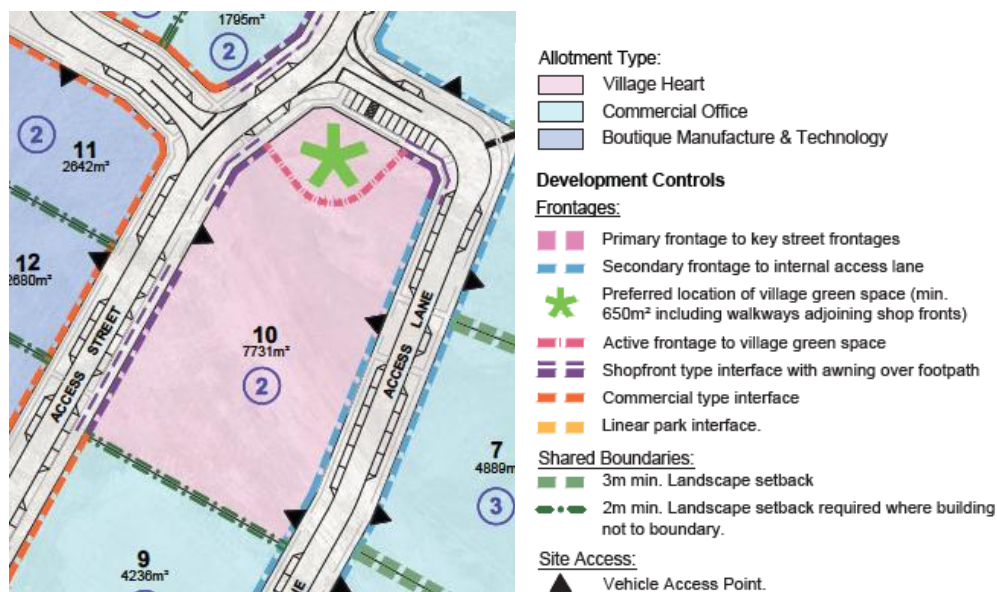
Stage 22A Plan of Development Plan (Source: RPS)
